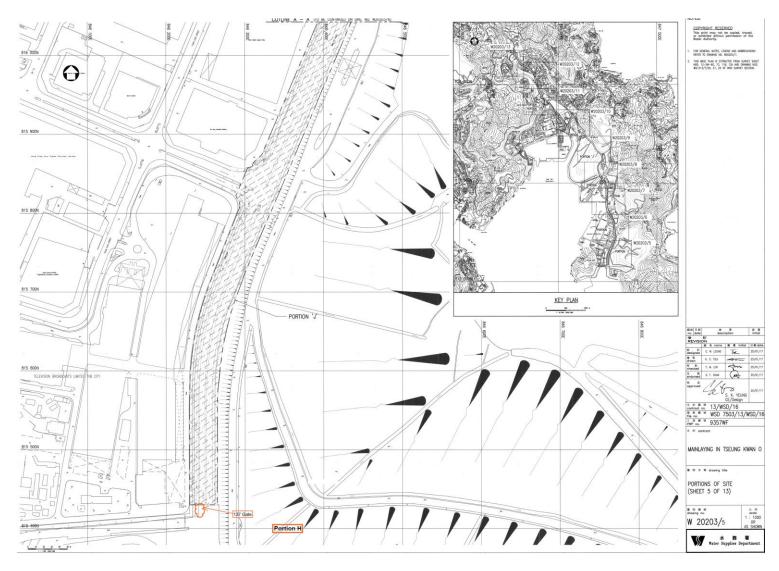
Location Plan for Portion H– TKO Area 137 Entrance (137 Gate)
